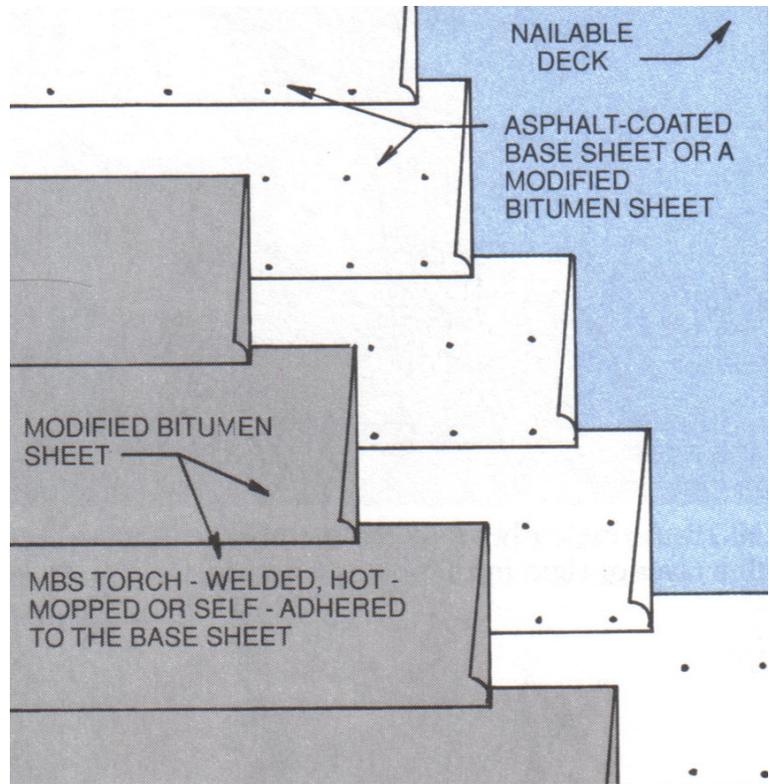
Typical modified bitumen roof system detail (Spence, 1998)
